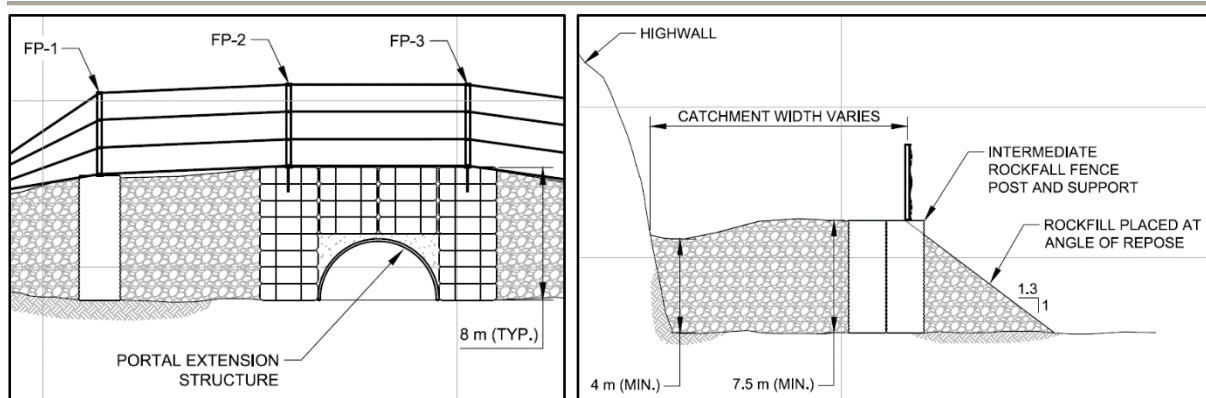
Select details from the rockfall mitigation design showing an elevation view of the portal extensions with fence on top and section view of the intermediate fence post supports.
